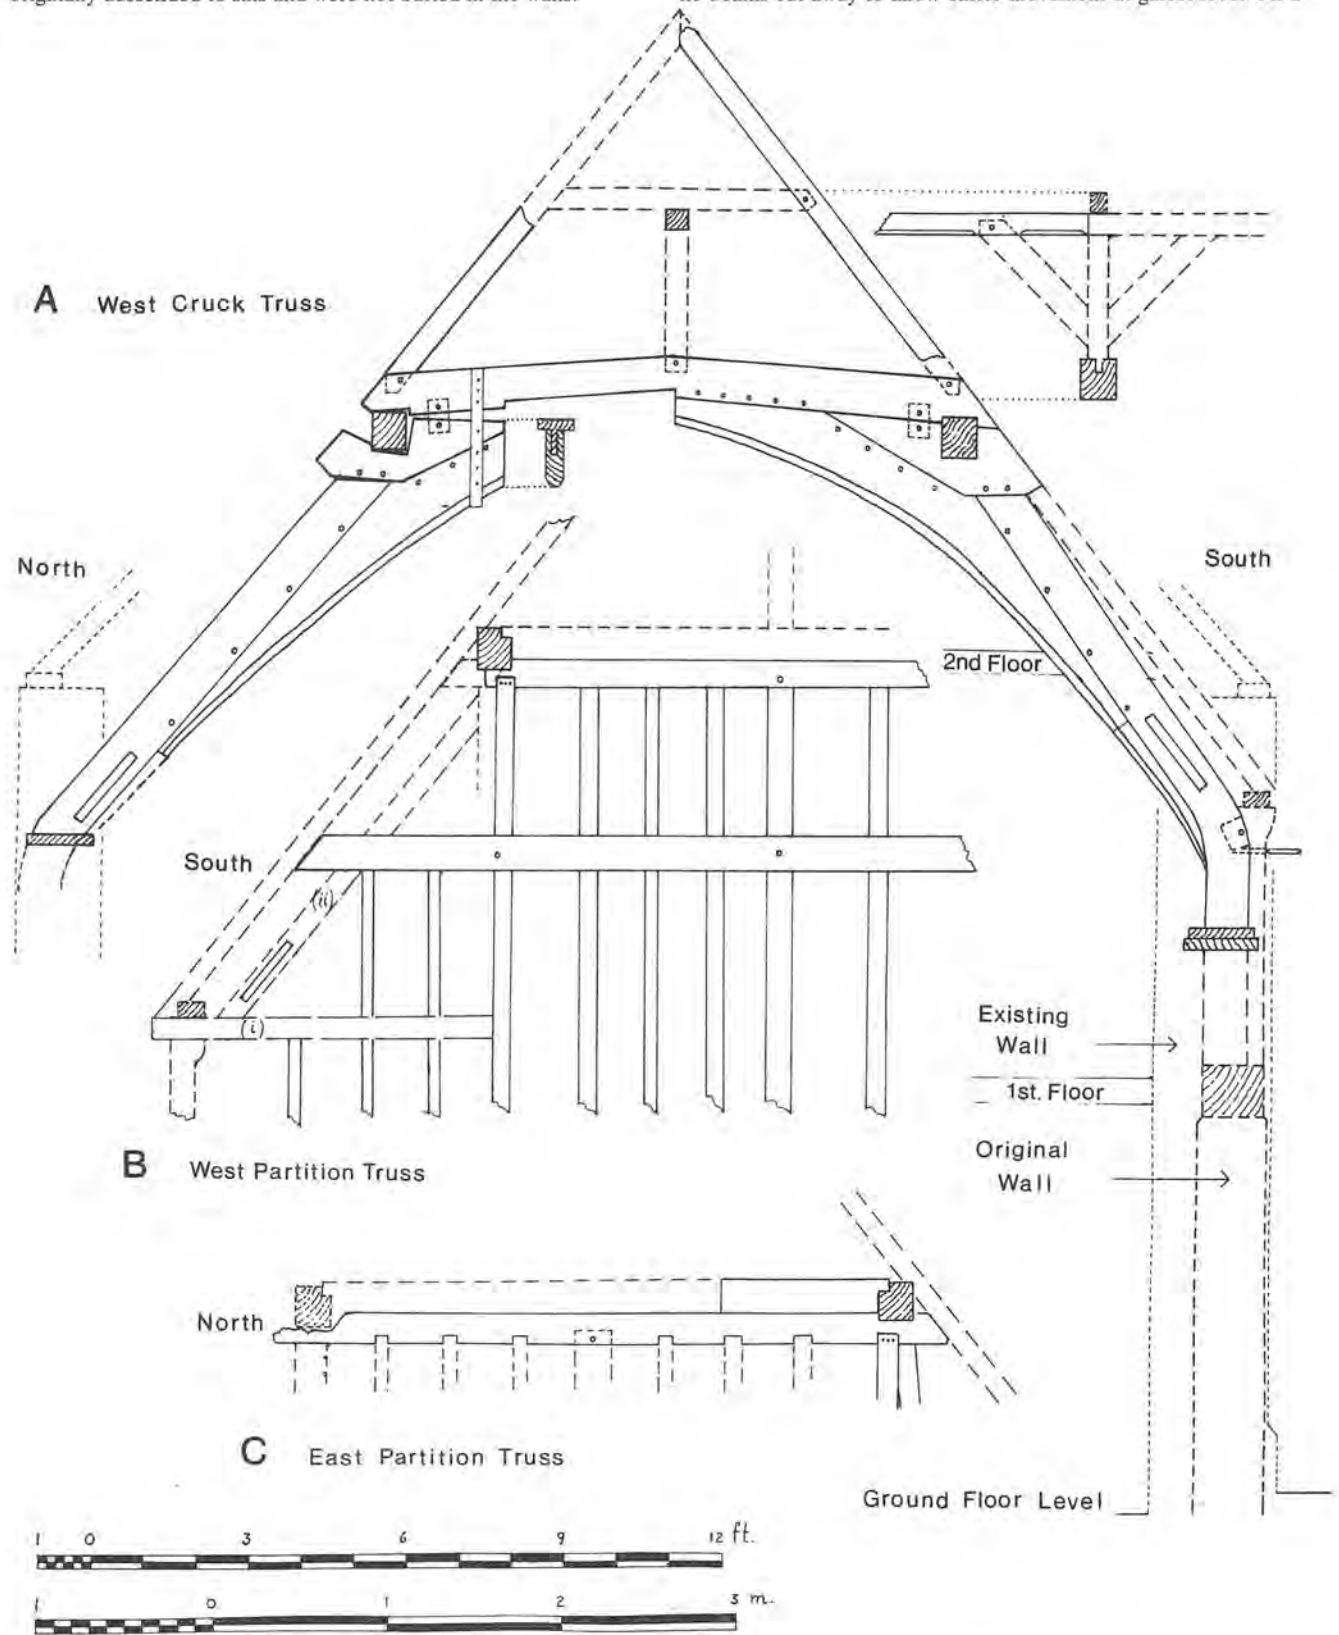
Hall House, Newland. Details of trusses. Solid lines indicate existing timbers.
